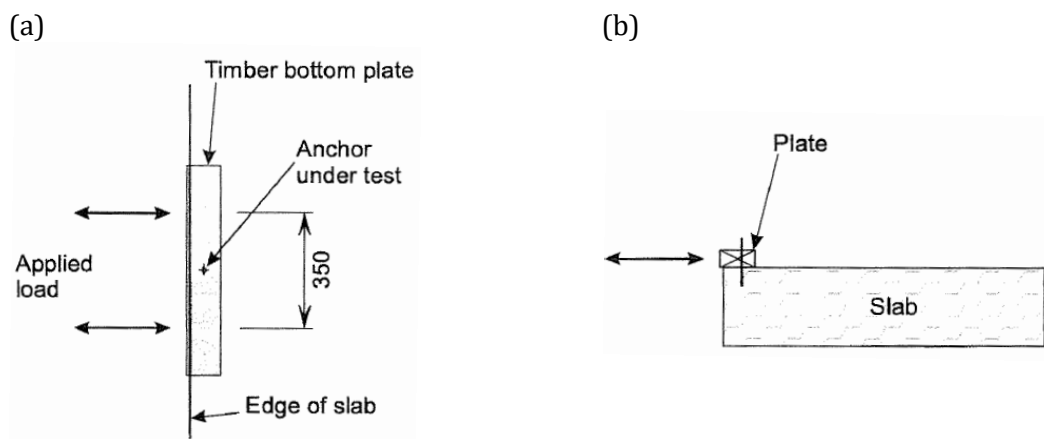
Schematic out of plane shear test setup as per BRANZ Study Report No. 125, (a) plan view, (b) side view
